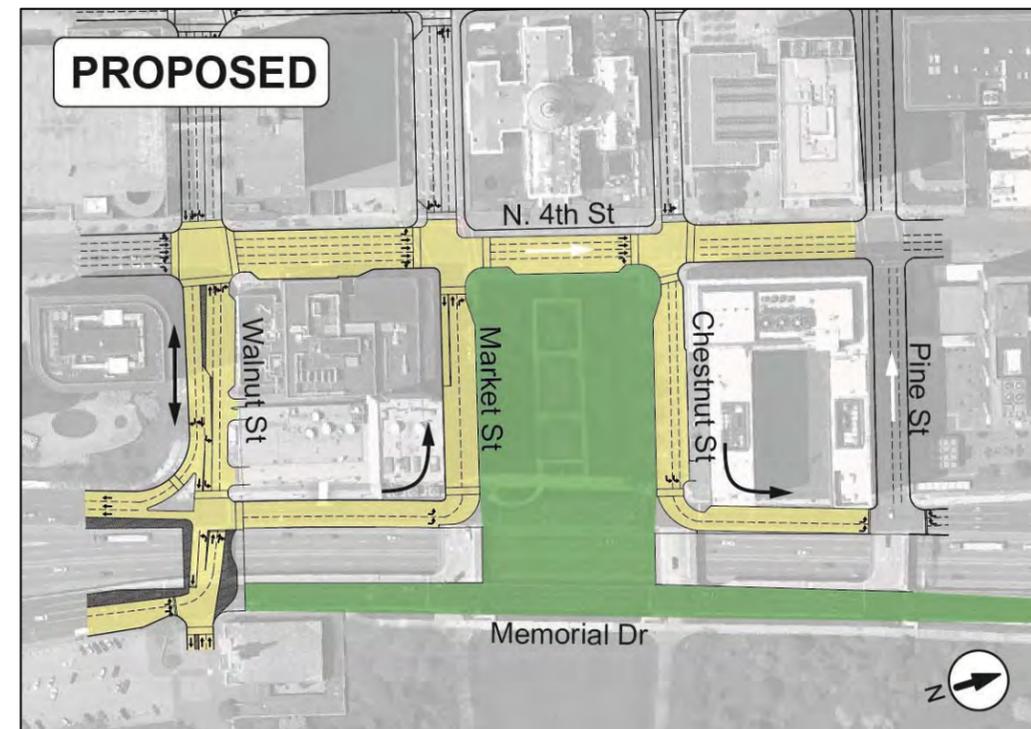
Proposed Memorial Drive Layout with Park over the Highway and Downtown Access via Walnut Street Bridge
